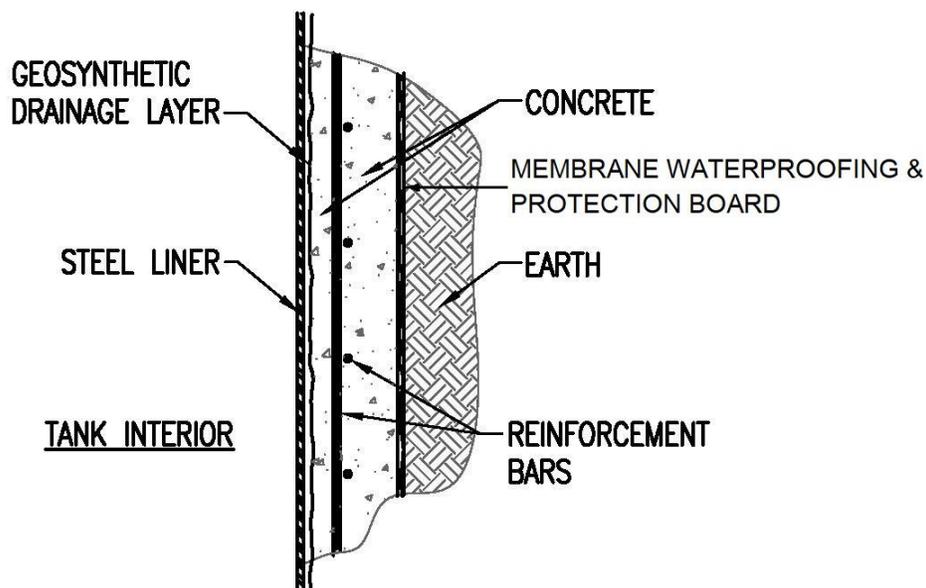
New Cut-and-cover Tanks - Typical Wall Section
